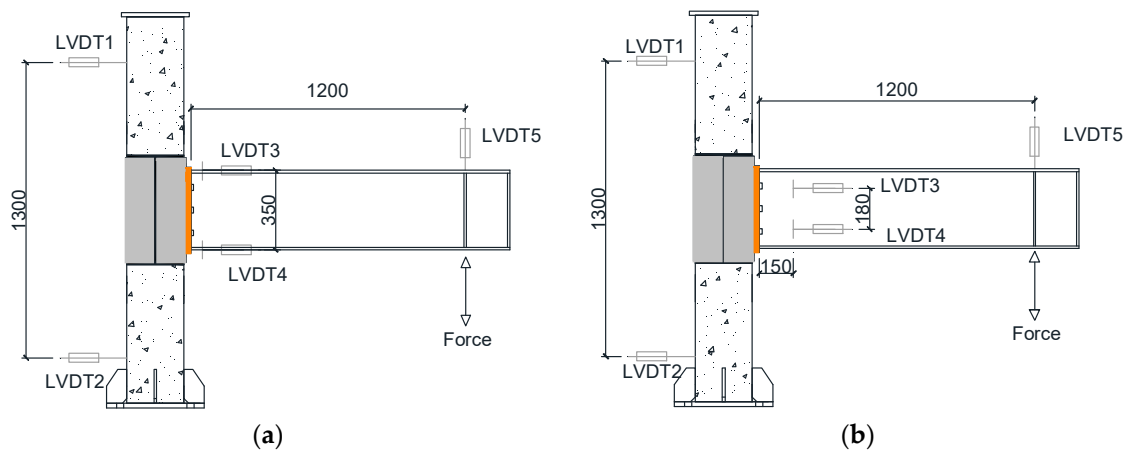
Arrangement of LVDTs (unit: mm). (a) For specimens ST-1~ST-5; (b) for specimen ST-6.
